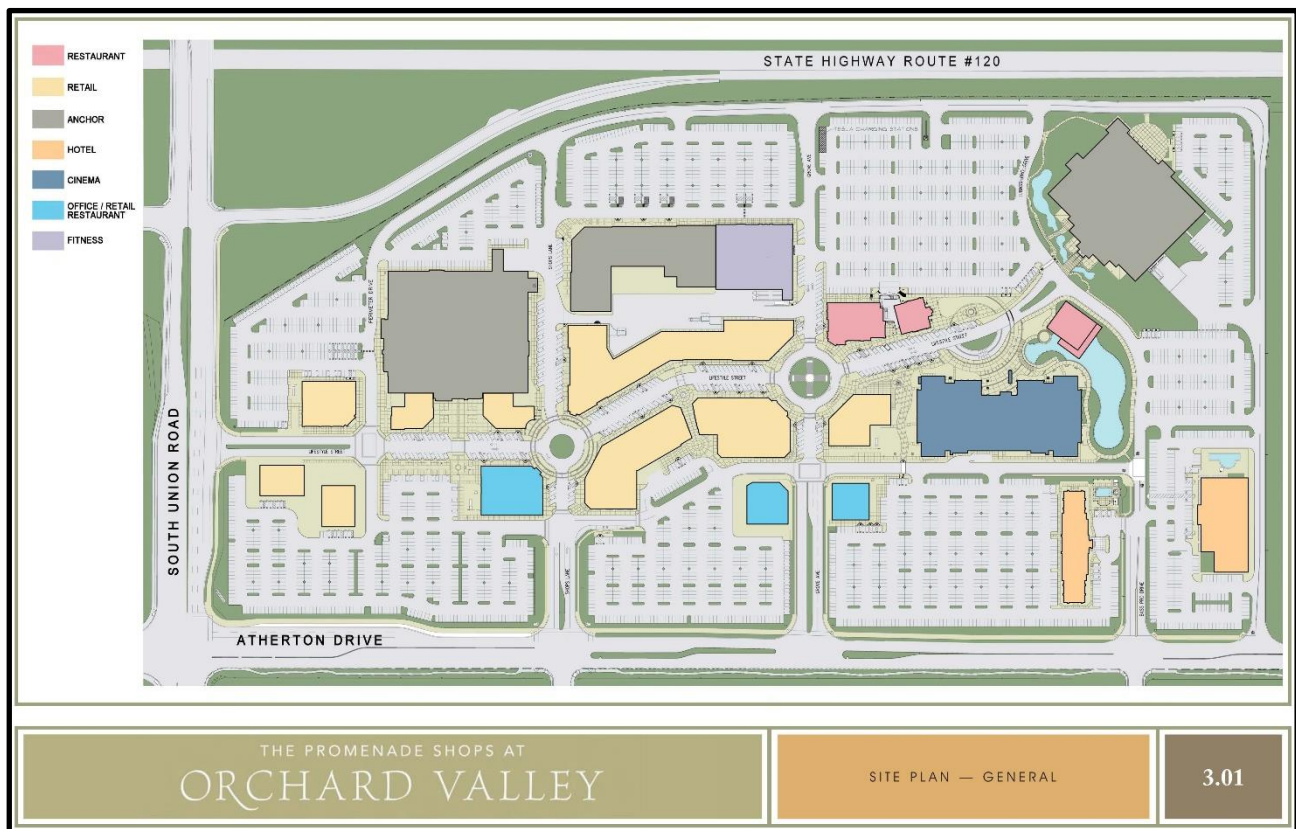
Original Planned Development Site Plan Showing Land Uses per Building
